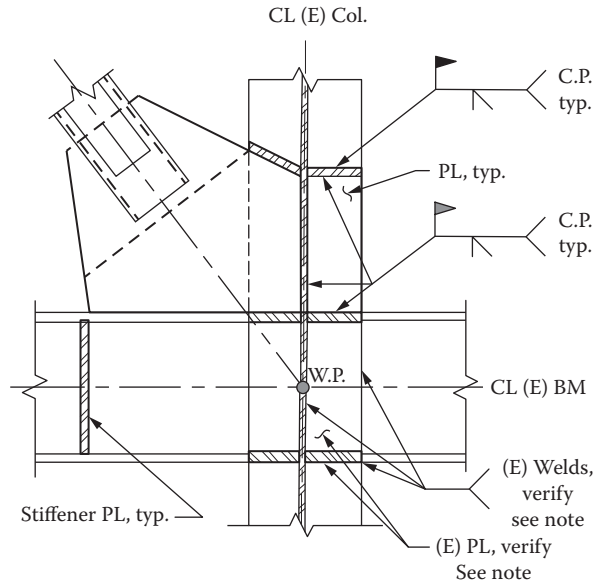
HSS braced at existing beam–column connection. *Notes:* Capacity of existing moment connection should be checked for new forces and strengthened if required.
